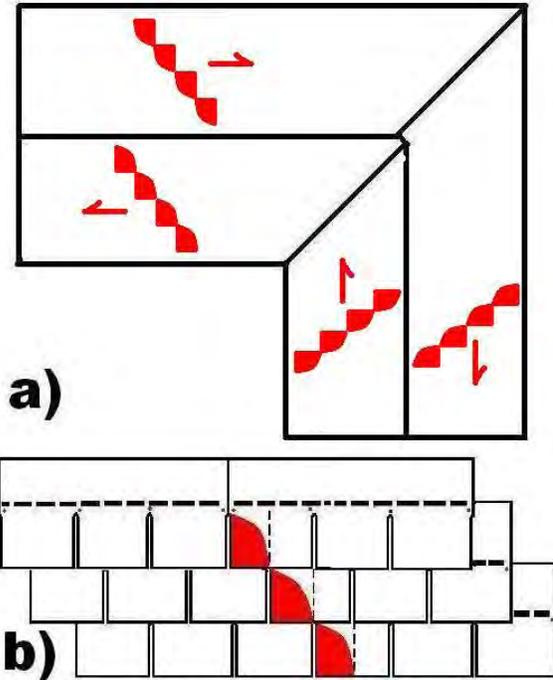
Diagonal pattern of shingle overlaps not bonded to the roof: a) roof plan showing open laps (arrows) pointing in different directions, and b) idealized diagram showing red shaded region where tabs could be lifted unimpeded by hand. This pattern extends diagonally upslope depending on the manner in which these shingles were installed.
